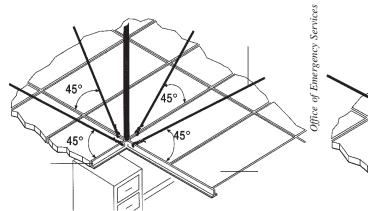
Bracing ceilings. This view from the top of the ceiling tiles shows diagonal bracing and struts to keep the tiles from falling in earthquakes.
